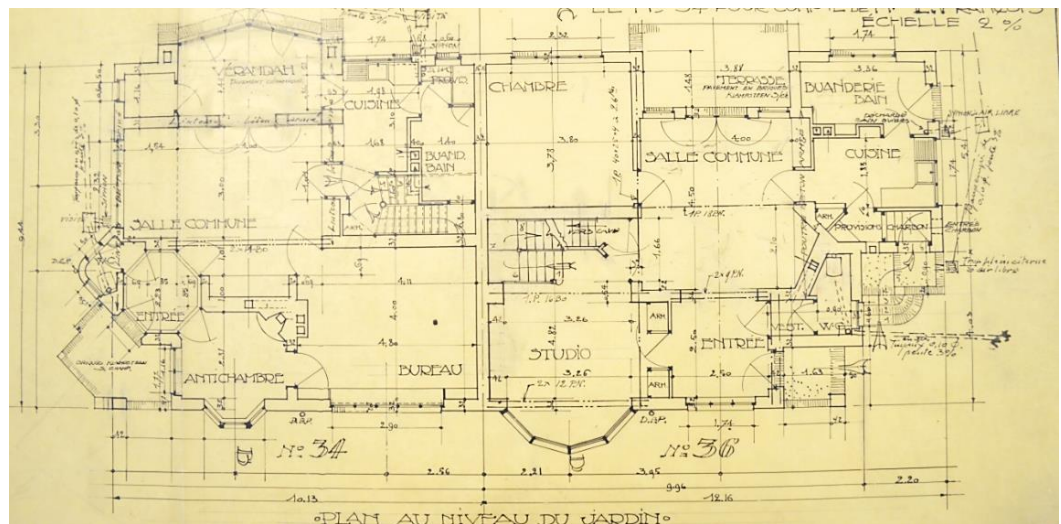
Plan layout of ground floor for both parts of the twin villa
